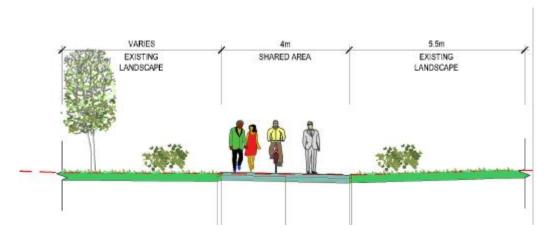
Cross Section for proposals on Cabinteely Greenway in Section D
